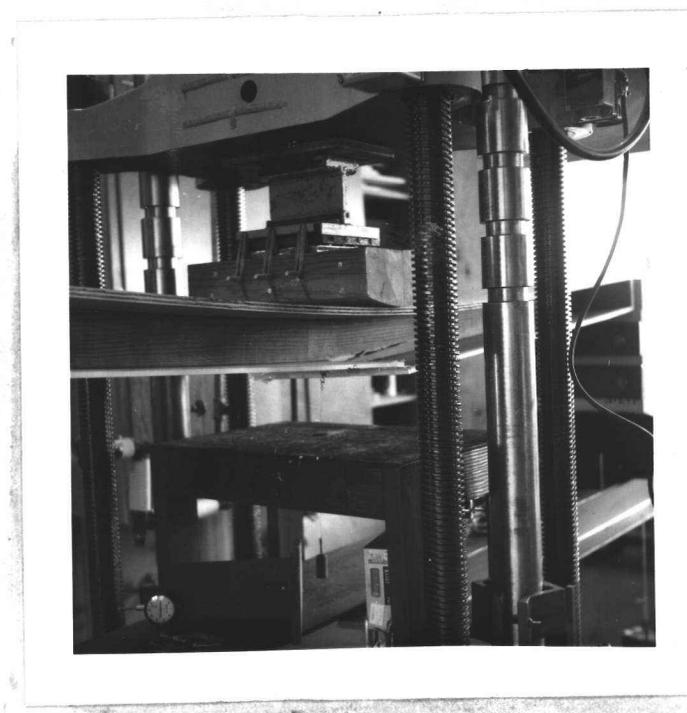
Typical bending failure of the wall panels with an overlapping construction.
